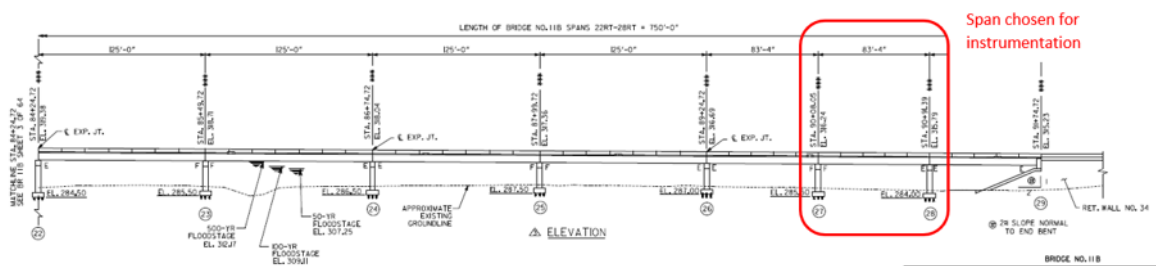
Engineering drawing. Elevation view, bridge Sheet 3 of 64, Bridge 11B plans
